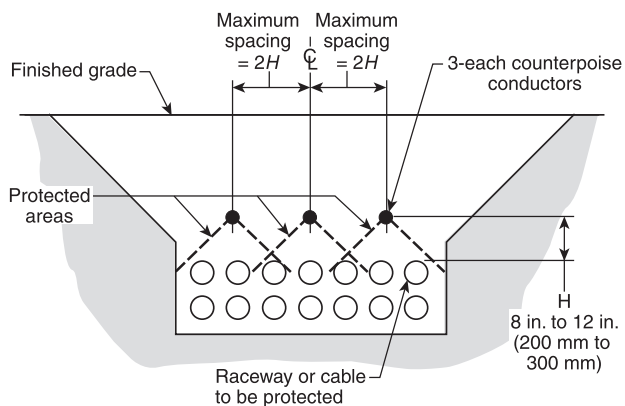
Multiple Airfield Lighting Raceways or Cables in a Common Formation.
